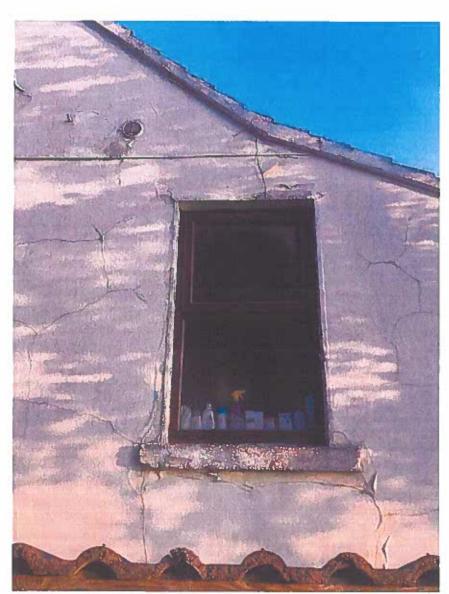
Hairline Cracking throughout walls and Structural Crack over Window
